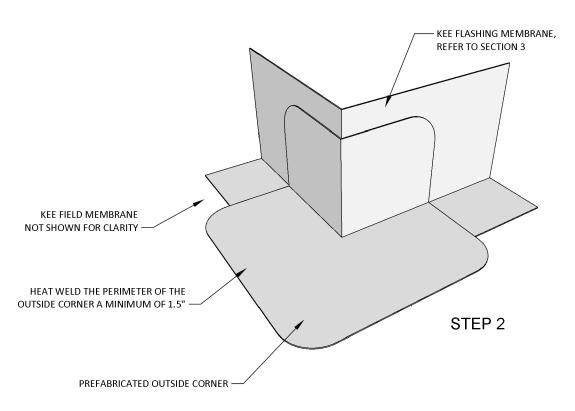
Adhered KEE Field Membrane with Prefabricated Flashing at Outside Corner
